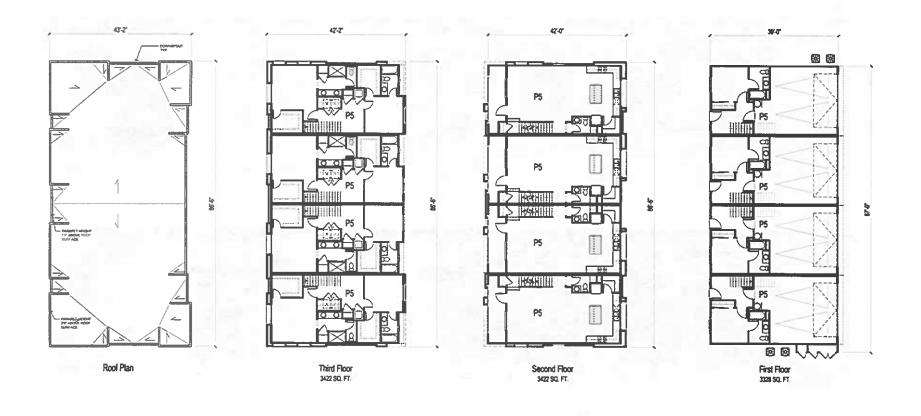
Conceptual Architecture - 4-Plex Building Floor Plan "A"
